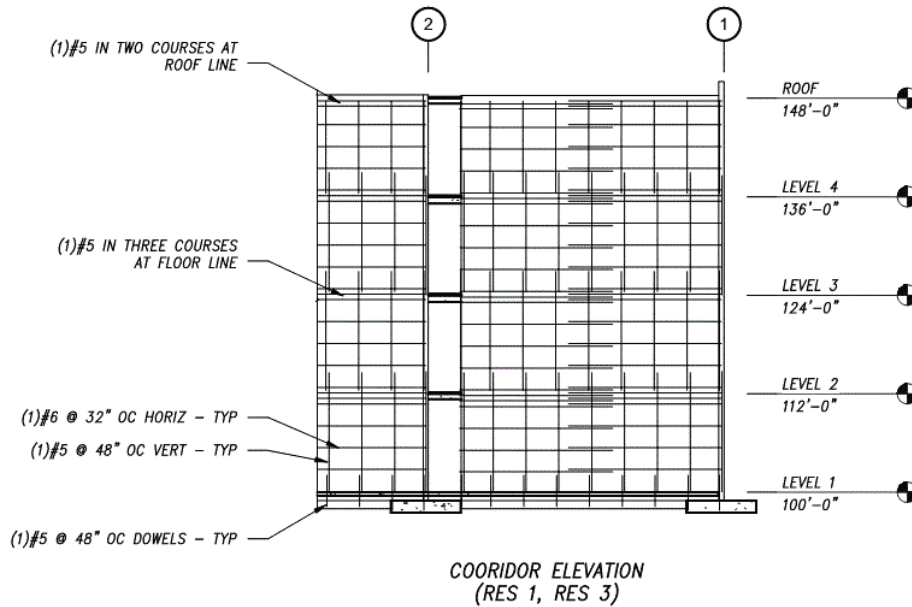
Four-story residential building corridor elevation: RES1, RES3.
